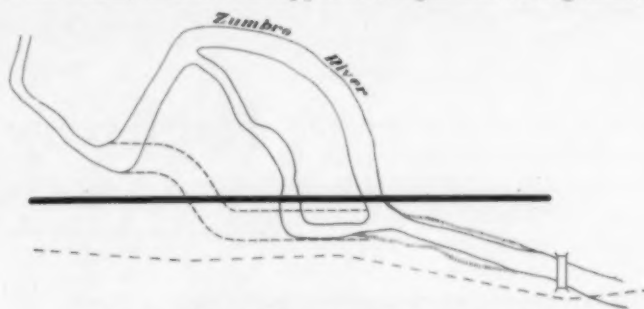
RIVER REALIGNMENT IMPROVEMENT Zumbro River, Minnesota
